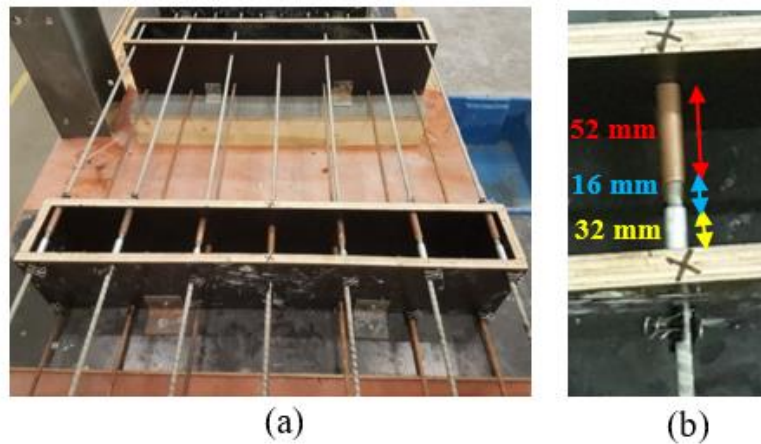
Formwork for the pull-out block; (a) slanted view, and b) copper and aluminium sleeves used as bond-breaker mechanism.
